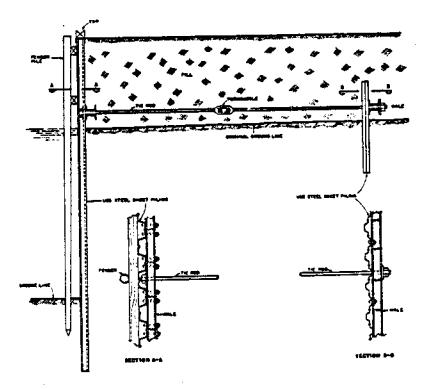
Steel bulkhead with timber fender piles (U.S. Steel, 1976, p. 74)
